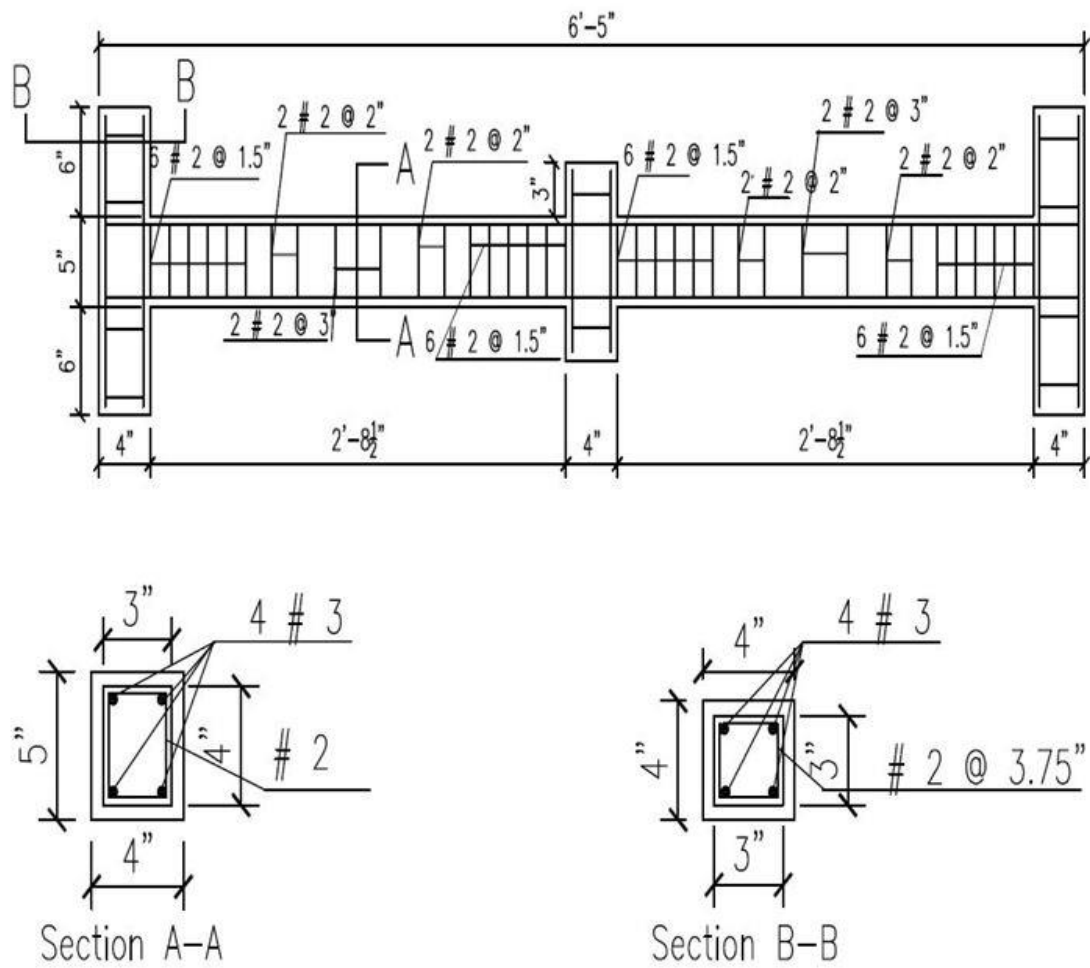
Typical Cross-section for Two-span Sub-assembly with Steel Reinforcement and Seismic Detail
